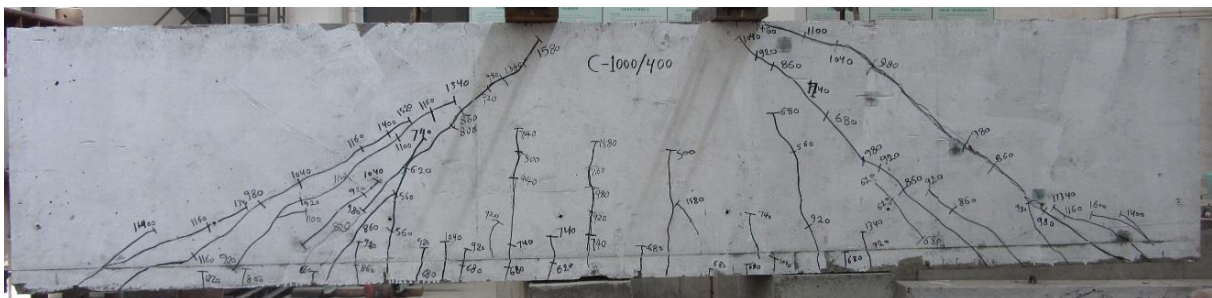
Control beam crack pattern (C-1000/400)
